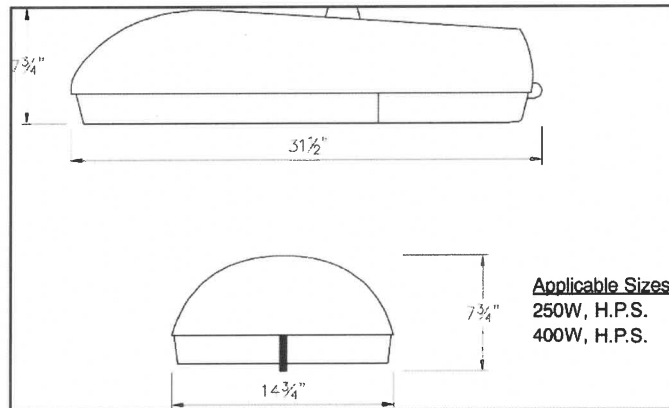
Typical Horizontal Luminaire, Flat-Glass Type with Power Door
